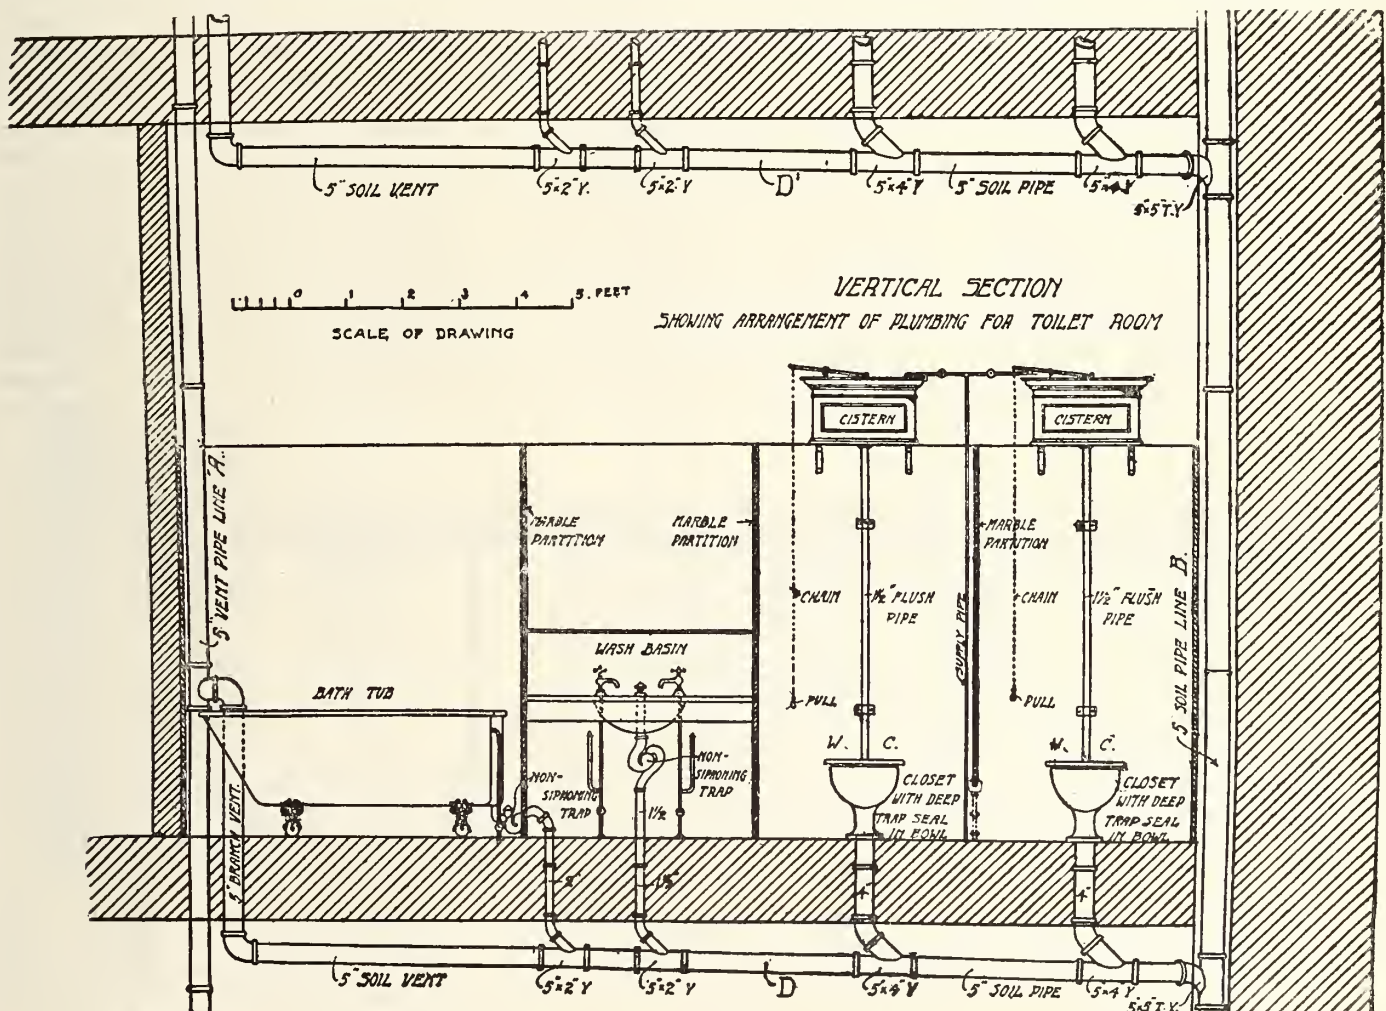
Section showing simplified plumbing for group of hotel toilet rooms, with two w.c.'s, one basin and bathtub on each floor.
